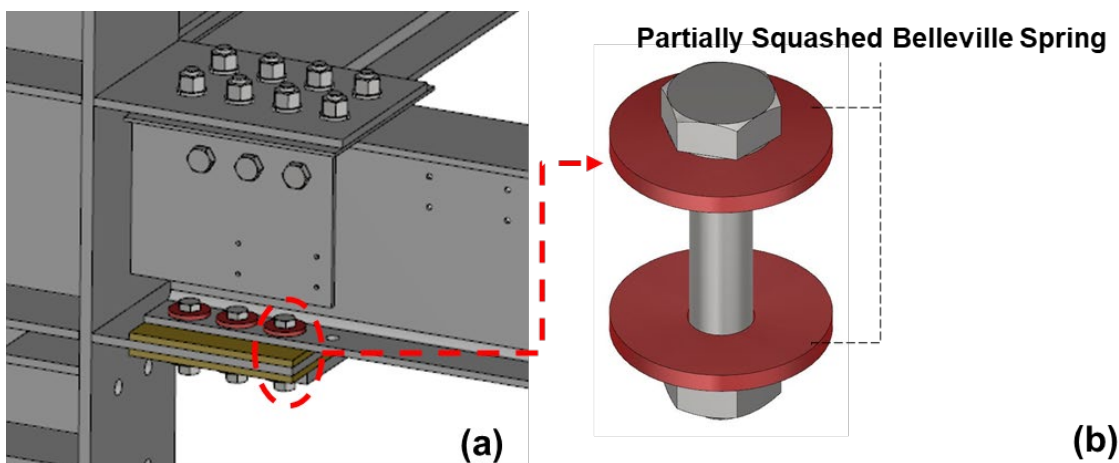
Close up View of (a) OSHJ and (b) Belleville Springs Assembly
